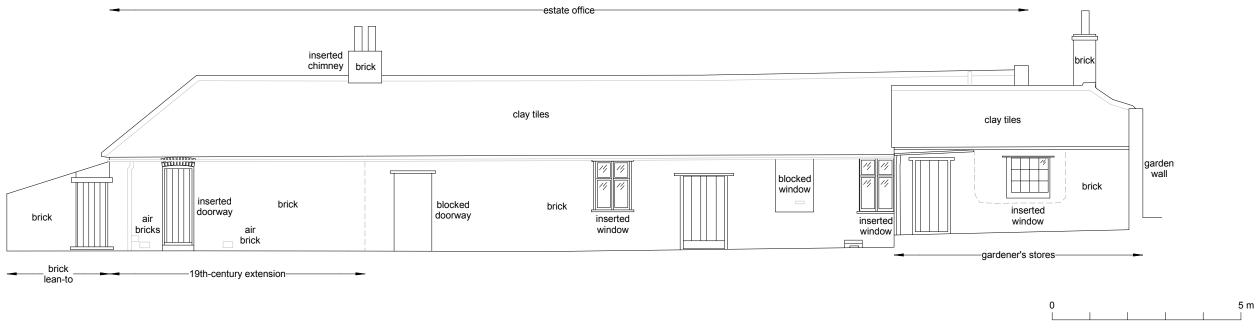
Structures 3 & 3a, 18th-century estate office and gardener's stores north-west elevation.
